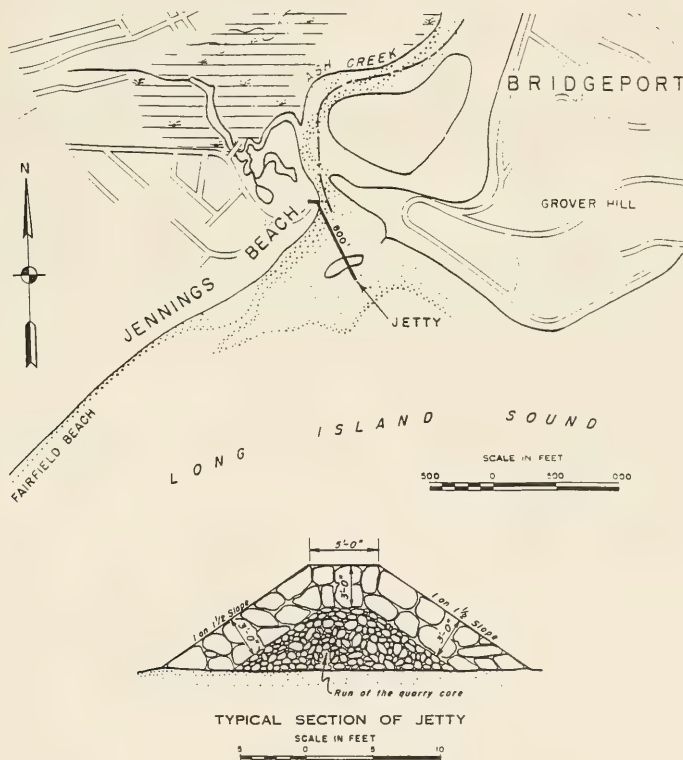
Plan view and cross section of jetty at Jennings Beach and Ash Creek, Conn.
